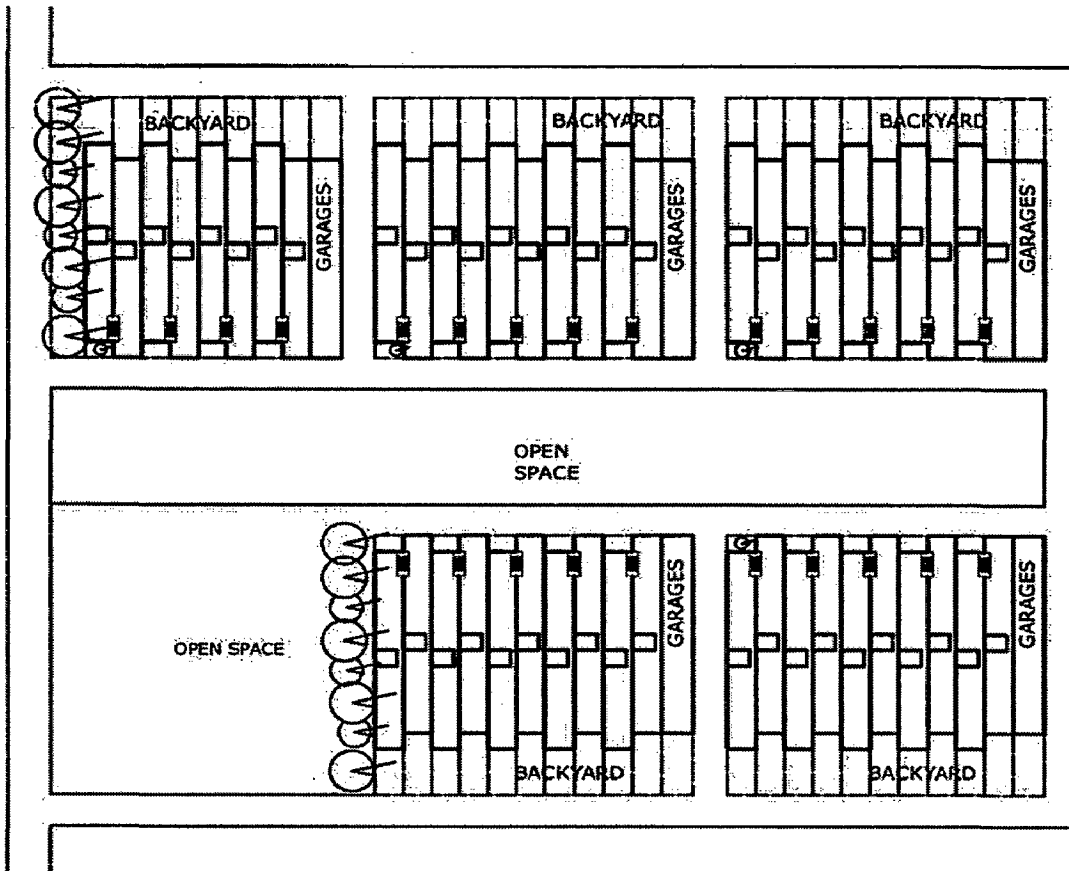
Site plan option-1 and view in rectangular site of Option -2
